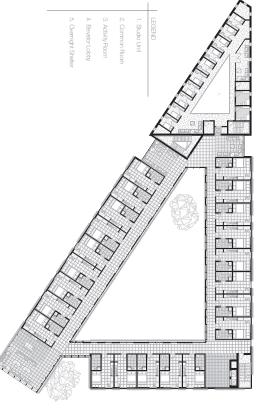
Home level 2/Ledo level 3 floor plan 1:500.
